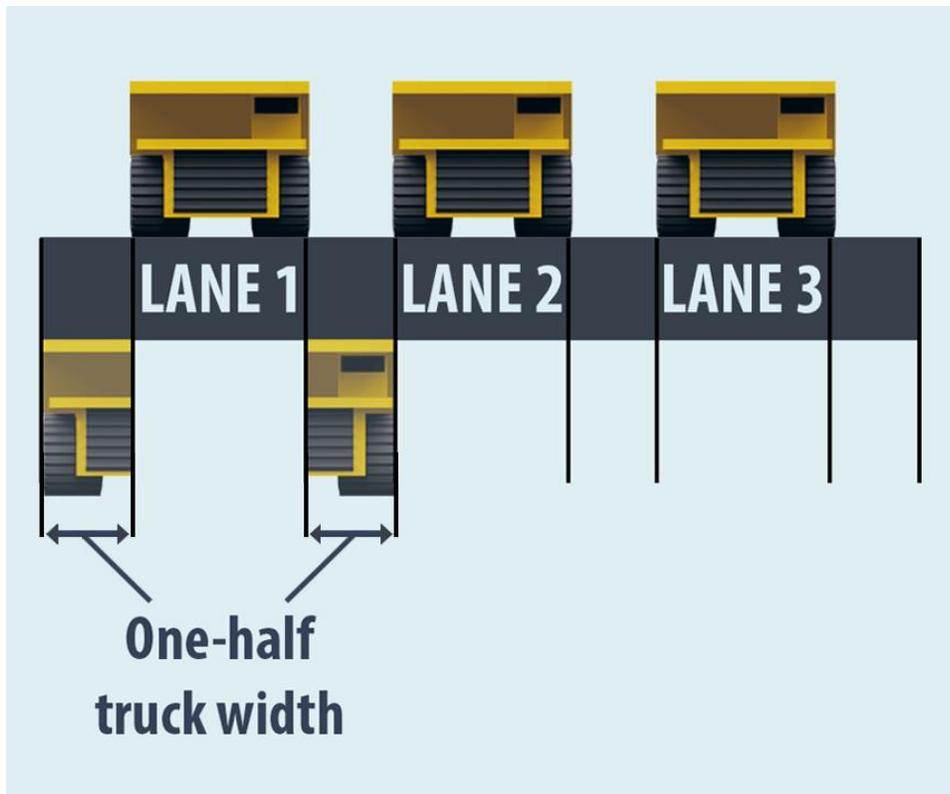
Diagram showing recommended one-way road widths for up to three lanes of traffic.
